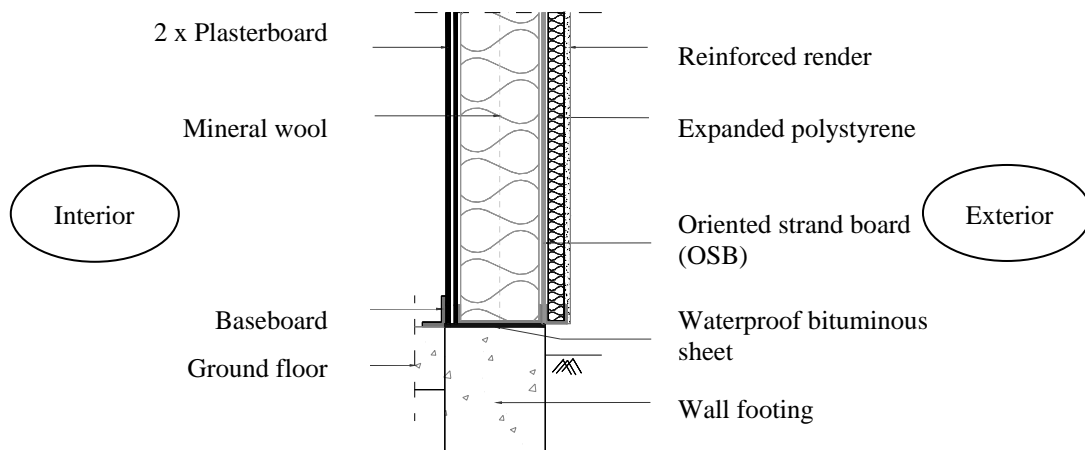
Sketch of a typical light gauge steel framing exterior wall.
